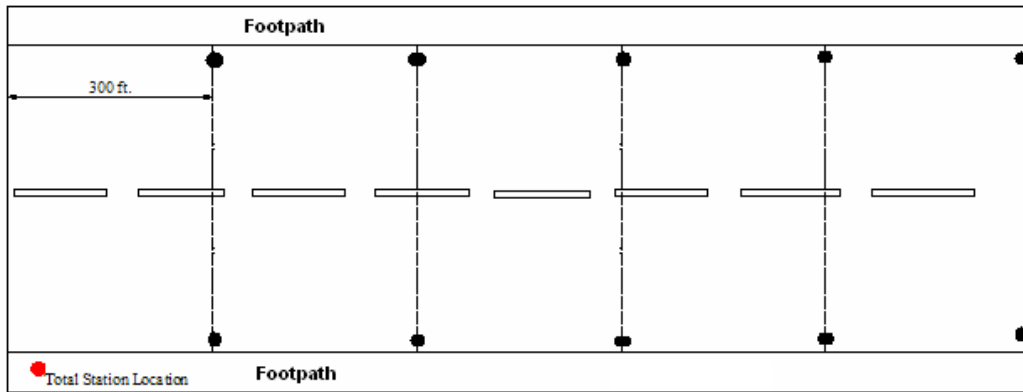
Plan Views of Elevation Survey Points at Southeast Parkway – West Bound
